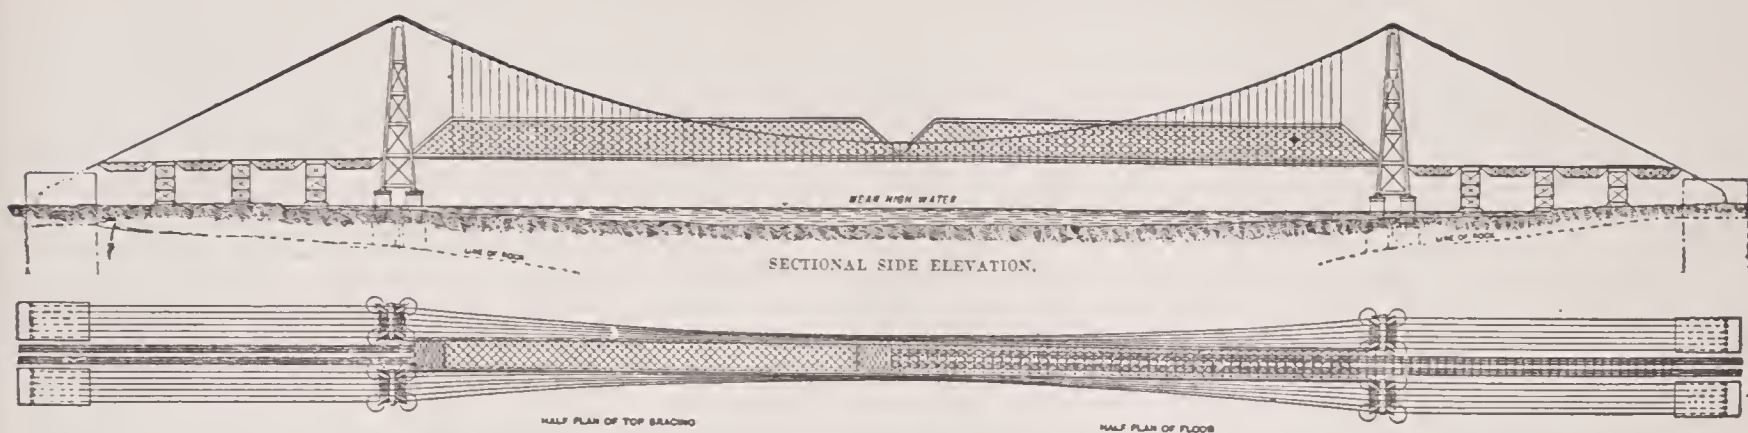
NEW YORK AND JERSEY CITY SUSPENSION BRIDGE, BEGUN IN 1897.
